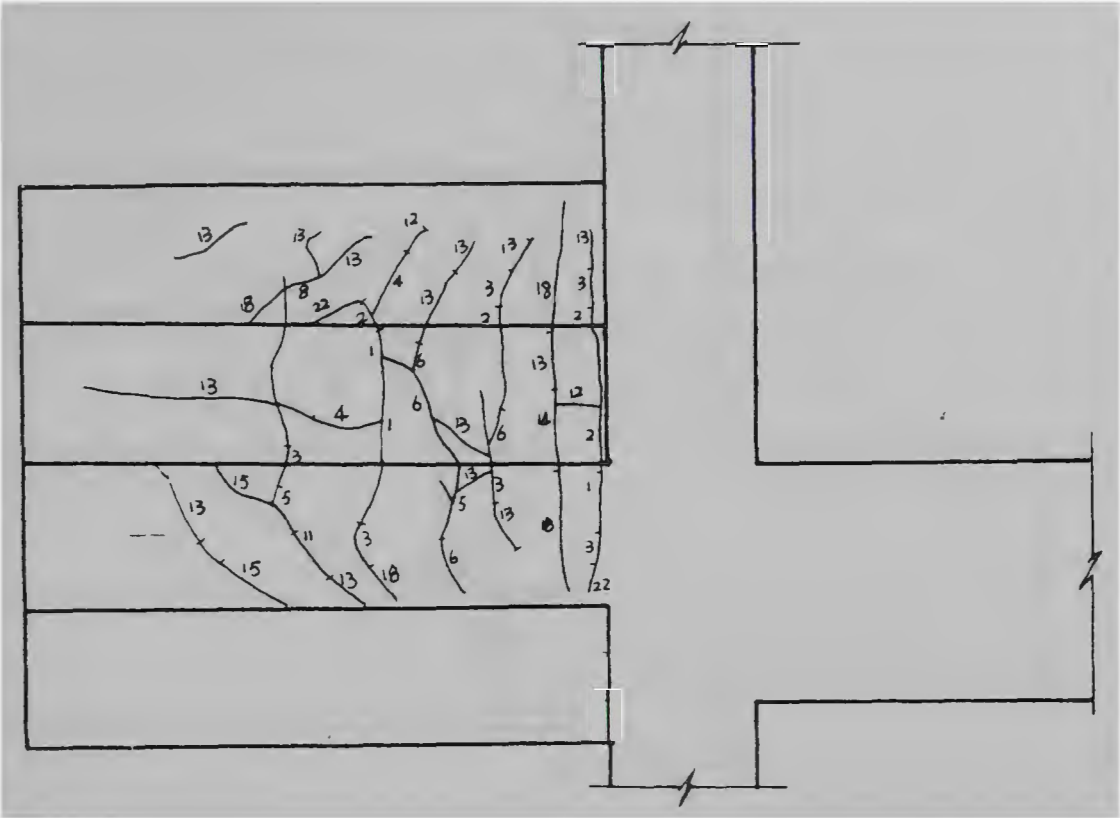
Crack Pattern for Specimen RPA2
